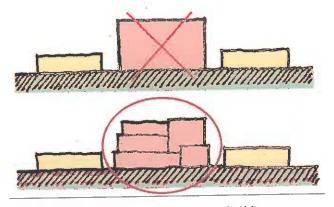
The mass of the larger building steps down near smaller buildings and the varied roof forms reduce apparent size.
